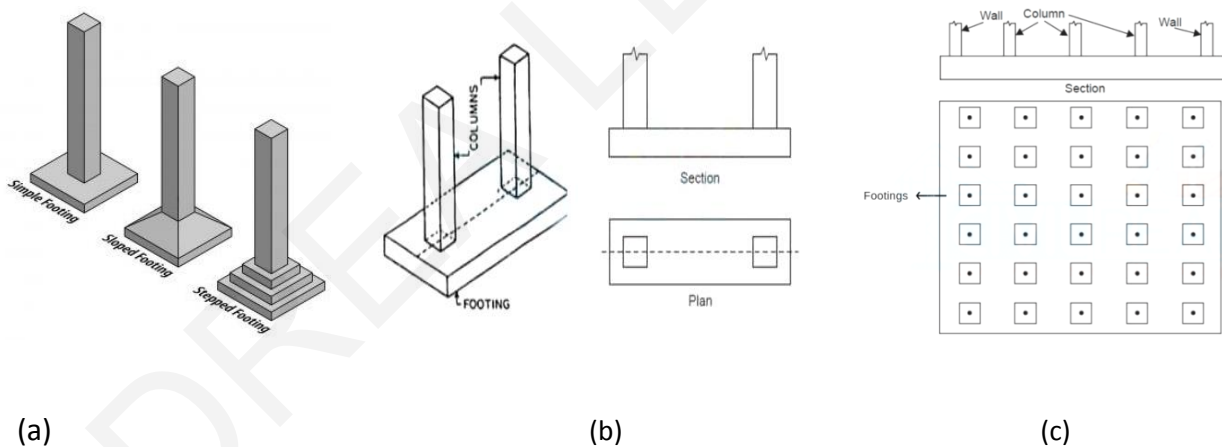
Types of shallow foundations: (a) isolated footing, (b) combined footing, (c) mat foundation (source: <https://civilread.com/different-types-footings/>)
